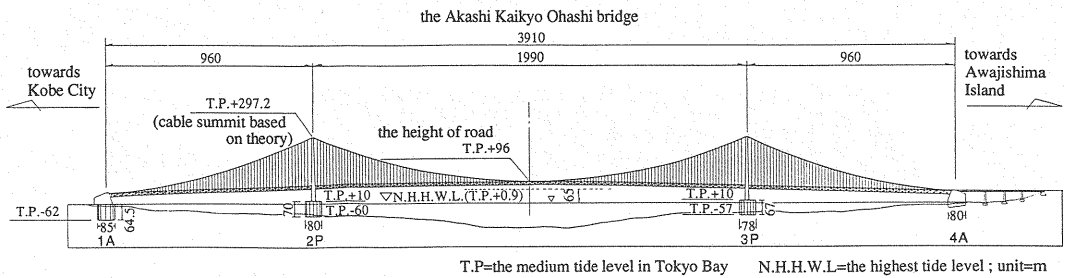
Vertical cross sections of the Akashi Kaikyo Ohashi bridge
